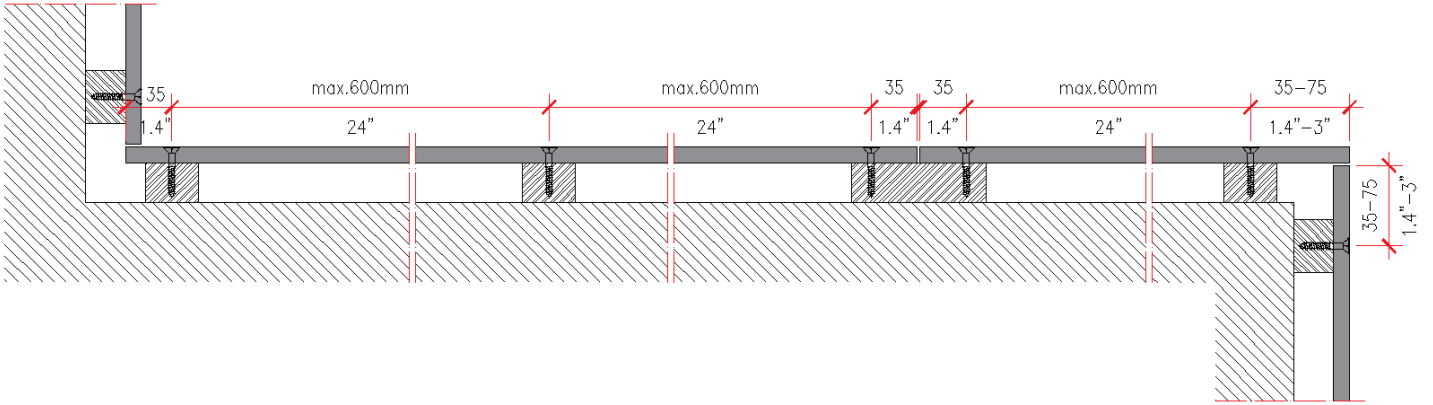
Horizontal section of wall cladding, wooden structure
